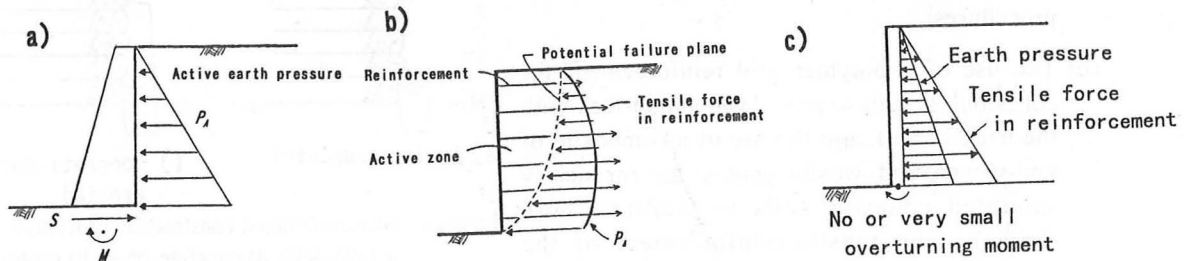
Force equilibrium for: a) a conventional type retaining wall; b) a reinforced soil retaining wall; c) a FHR facing of GRS-RW.
